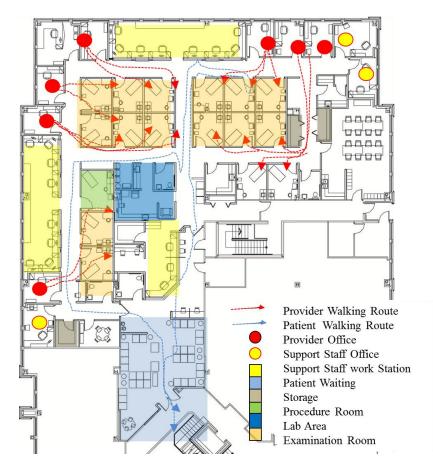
Annotated Facility Plan. Adapted Image Courtesy of Creative Access (Creative Access, 2009)
